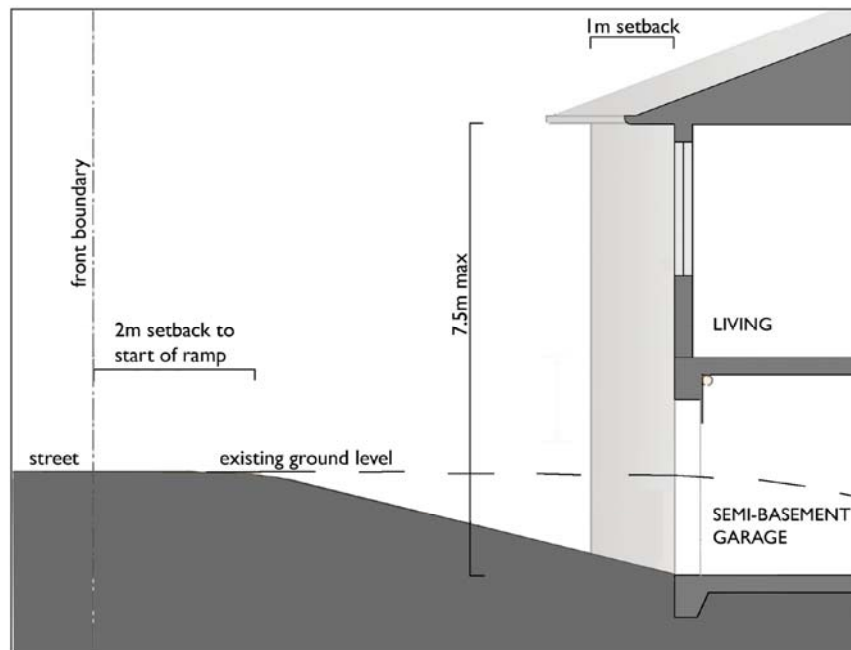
Only a single storey may be built above a garage. Basement car parking is included as a storey if it extends more than 1.2 m above ground level.
